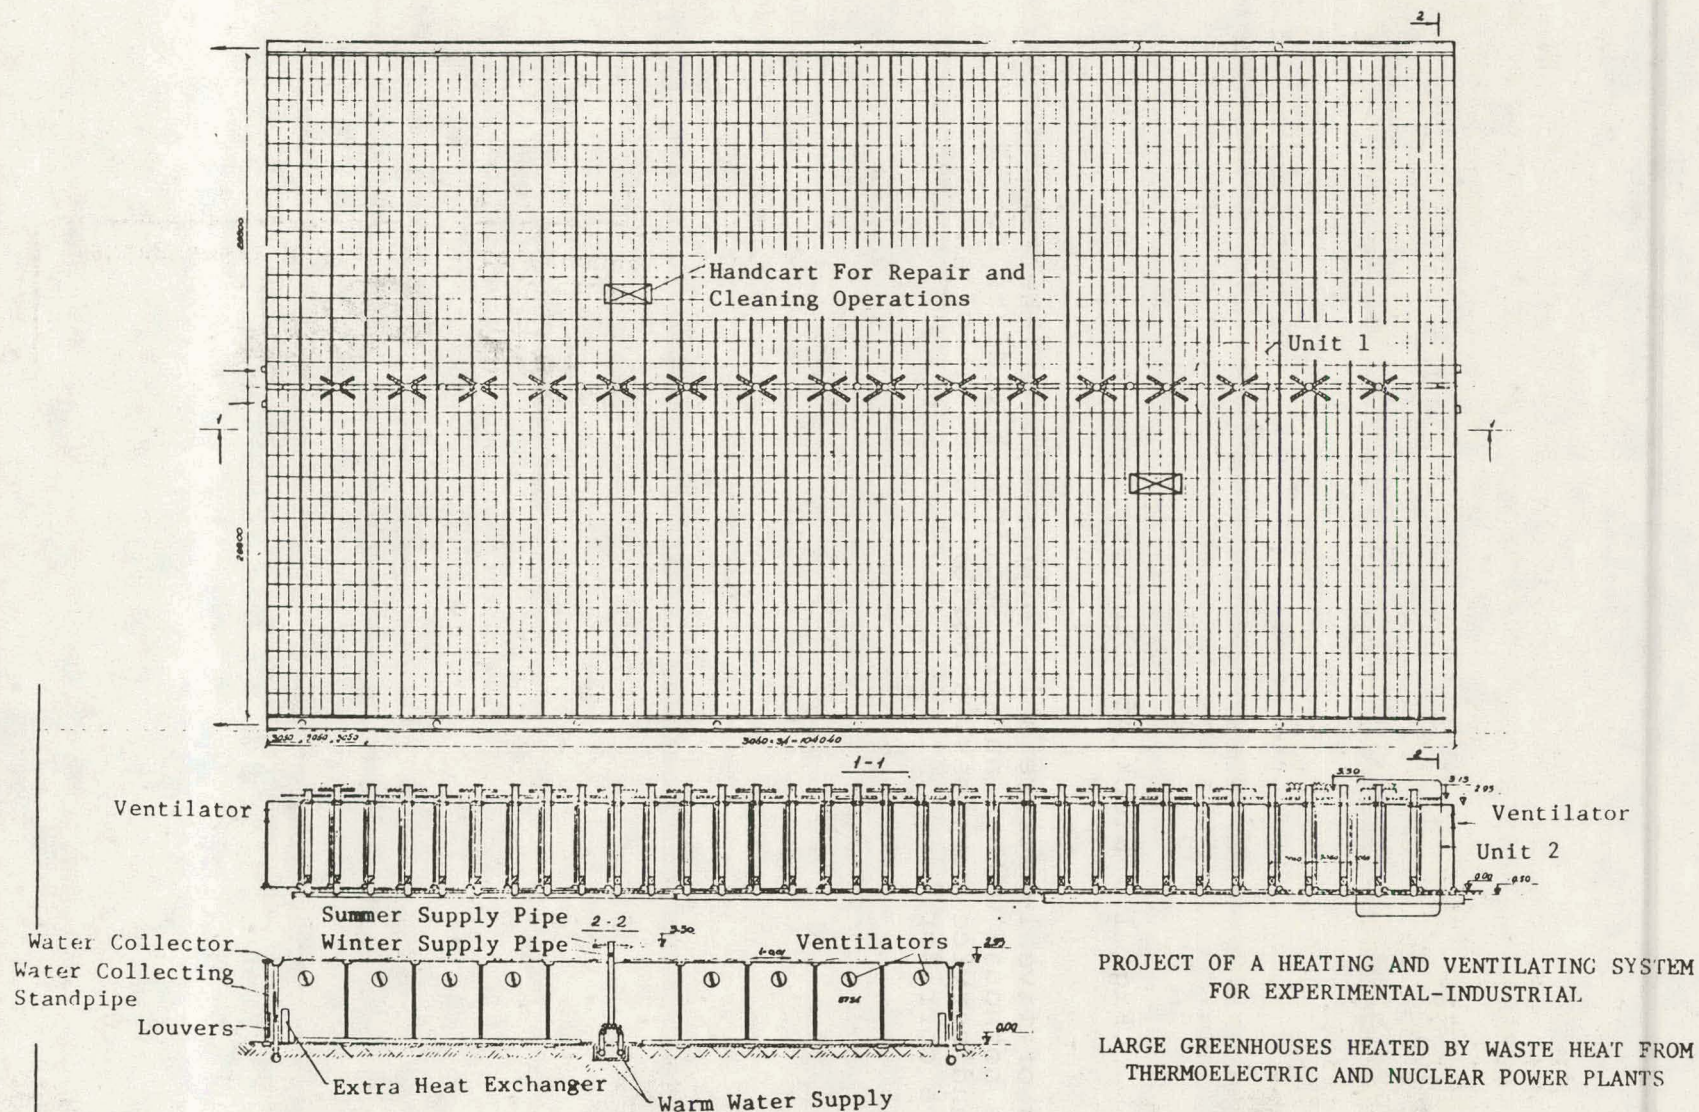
Plan of Greenhouse with Water-Filled Roof. This figure was taken from 'last year's translation (ORNL-tr-4485) entitled A Project of a Heating and Ventilating System for Experimental-Industrial Large Greenhouses Heated with Thermoelectric Power Plant and Nuclear Power Plant Waste Heat which is applicable.
